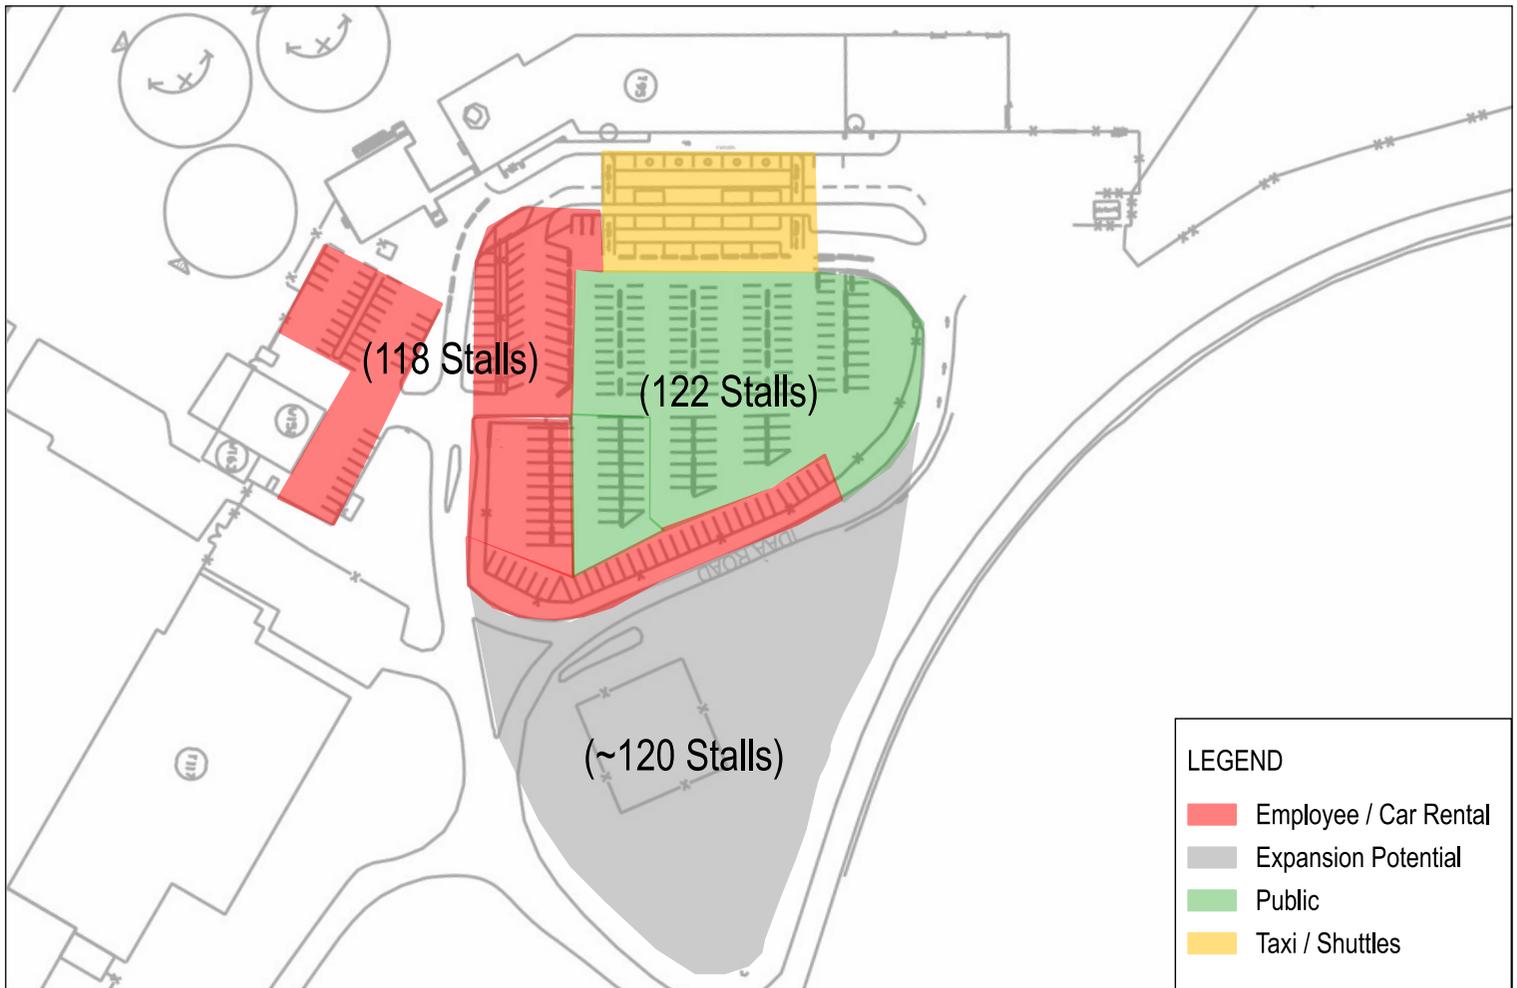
Existing ATB Parking and Curb Facilities and Expansion Potential
